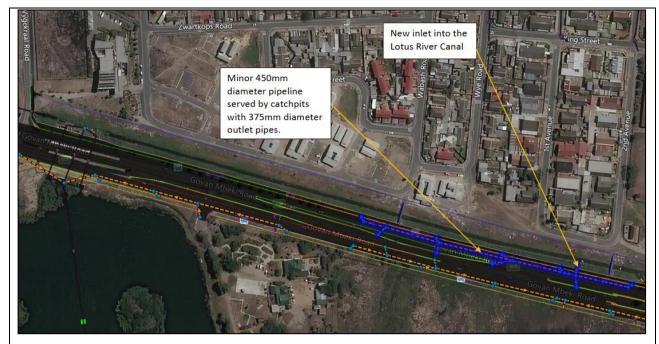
Proposed Minor Stormwater Drainage System (2) (source: GIBB, 2021)
